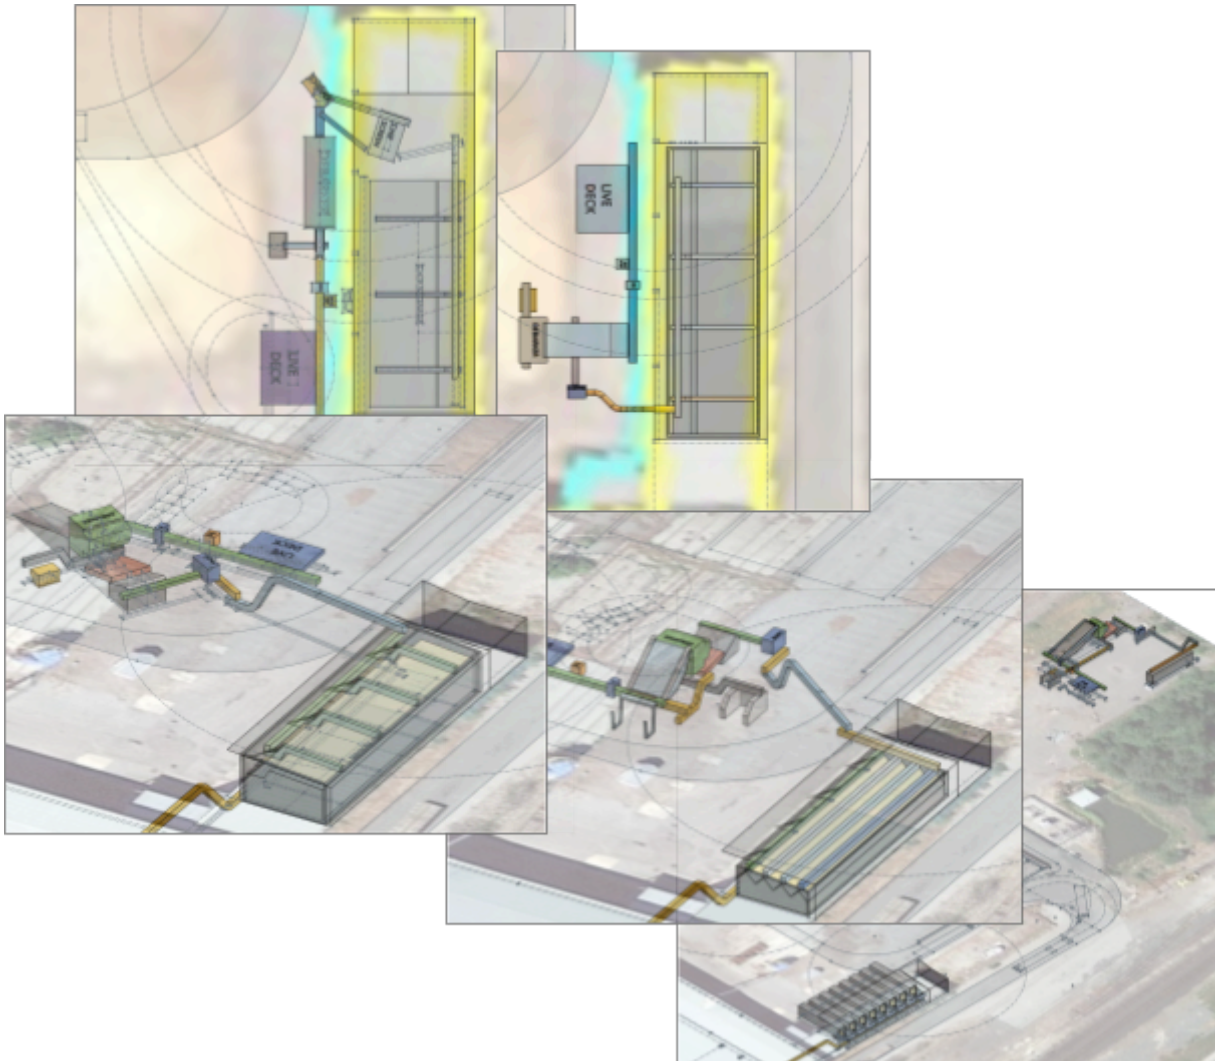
Snapshots of infeasible layout concepts considered in the Winton mill concept development process.
